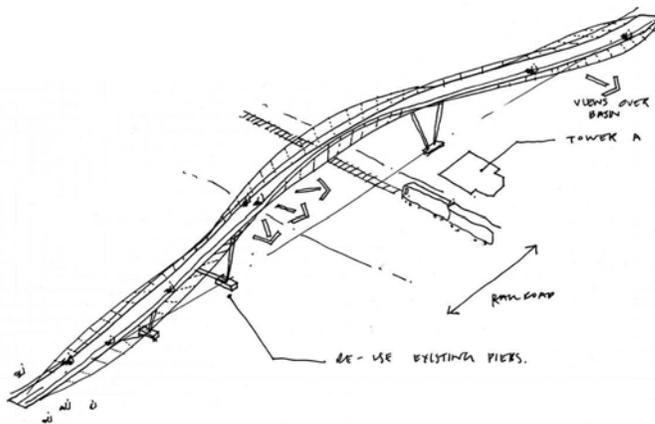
Concept sketch of bridge and site, from southwest looking northeast
